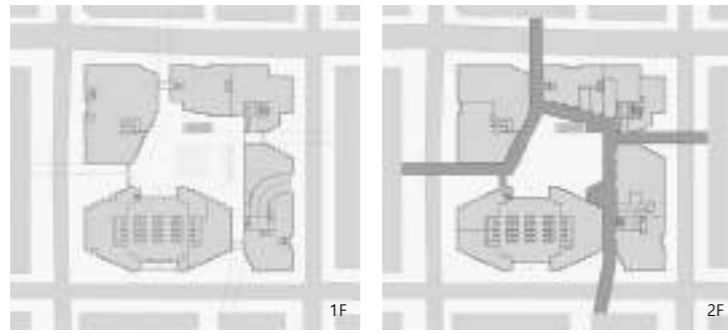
Site and Floor Plan of U.S. Bank Plaza
